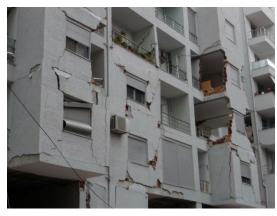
Earthquake-damaged infill walls, some of which have fallen out of the building.
